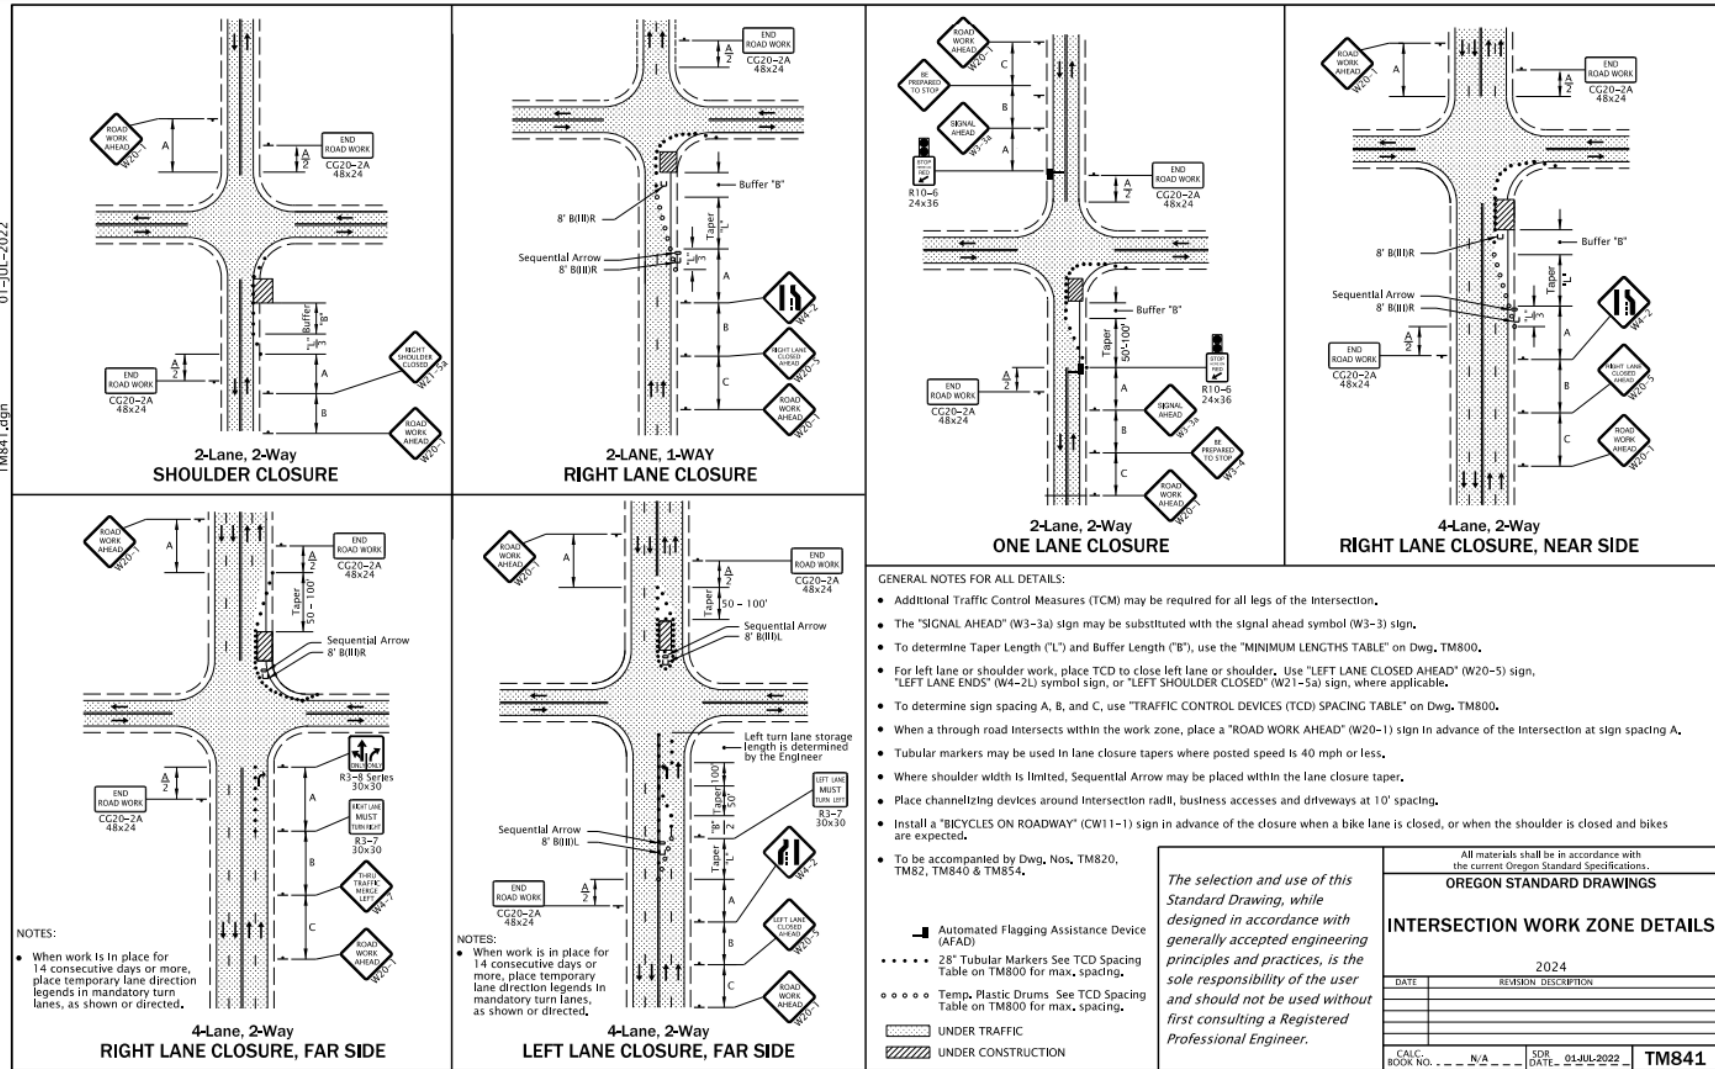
Example ODOT Traffic Control Plan Detail. Intersection Work Zone Details.
